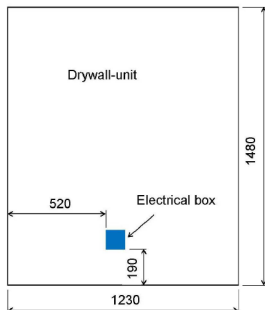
Variants 2 and 3: Electrical box 1 in drywall-unit (from sending room)
